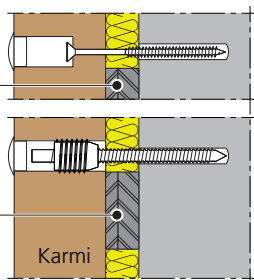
Vertical section of installations with wood screw and adjustable frame screw. Holes must be drilled all the way through for adjustable frame screws.
